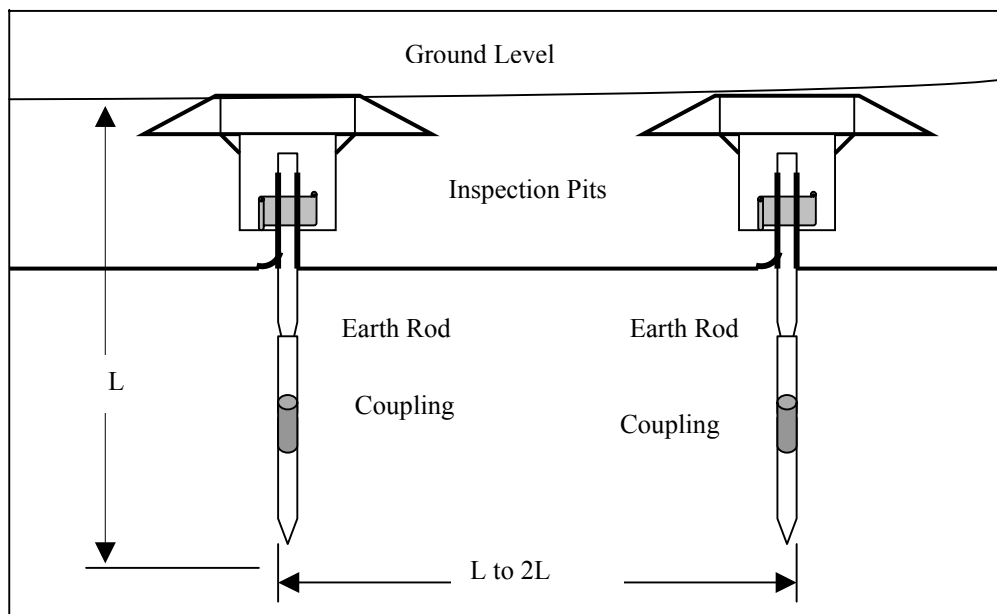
Spacing of Parallel Earth Rod Electrodes
